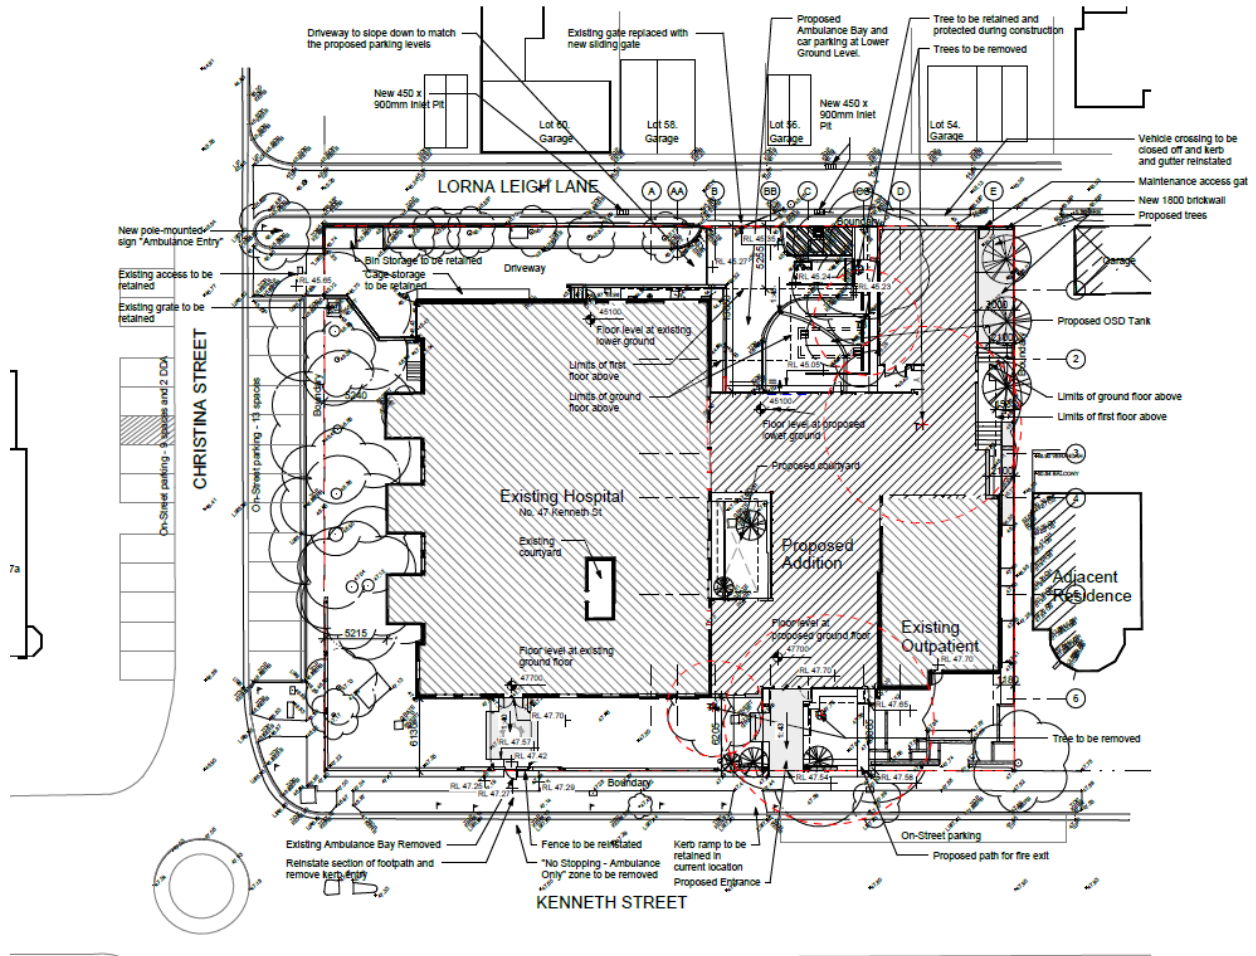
Proposed Increase in Scale of the Hospital Facility with Reduced Building Setbacks and Landscaped/Garden Setting
